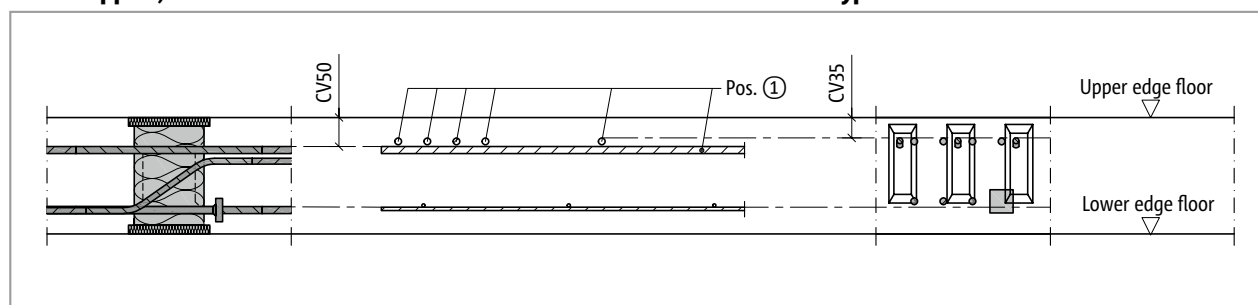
Schöck Isokorb® XT type C: On-site reinforcement outer corner (section XT type C-L-CV50, view XT type C-R-CV35)
